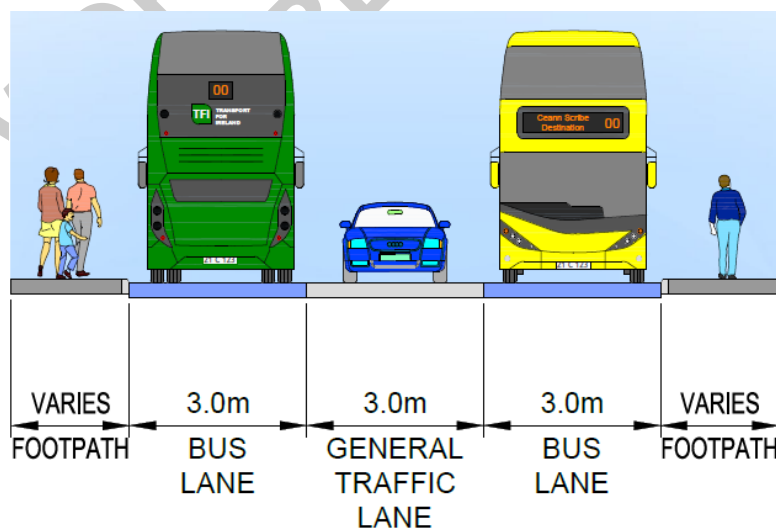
Section 2C, Proposed Option 2 – Cross Section A-A
